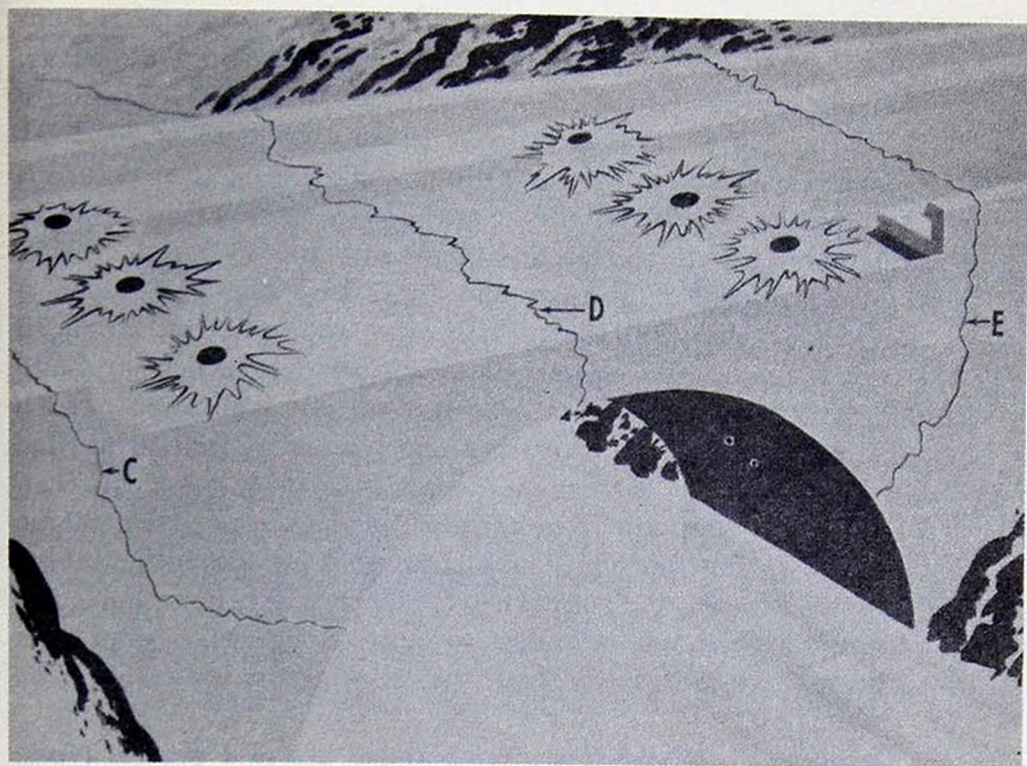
Placement of haunch charges for destroying a filled spandrel arch bridge.
